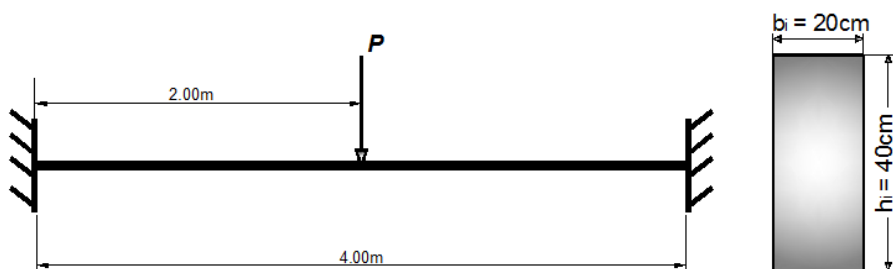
CLAMPED BEAM. GEOMETRIC AND SECTION DETAILS.
